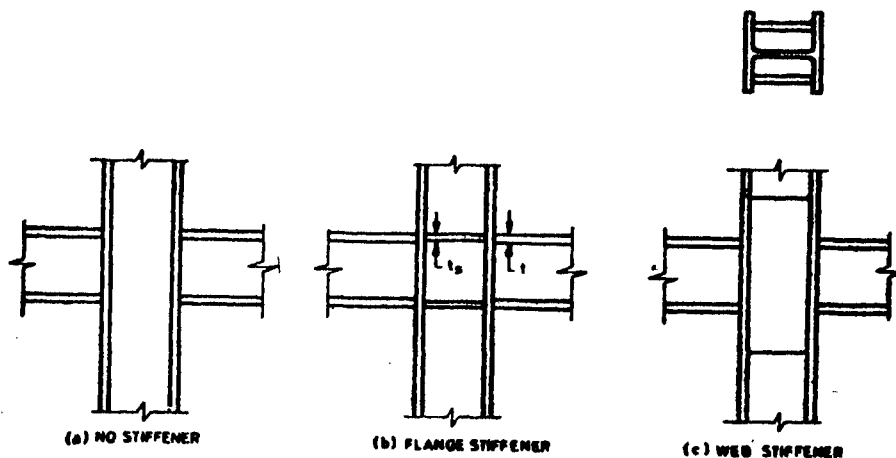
METHODS OF STIFFENING AN INTERIOR BEAM TO COLUMN CONNECTIONS
